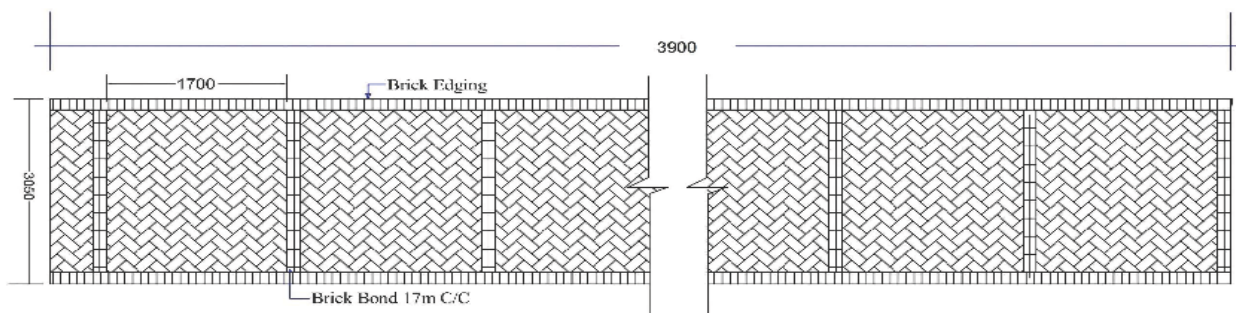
Example top view drawing of HBB road design (width 3.05m)
